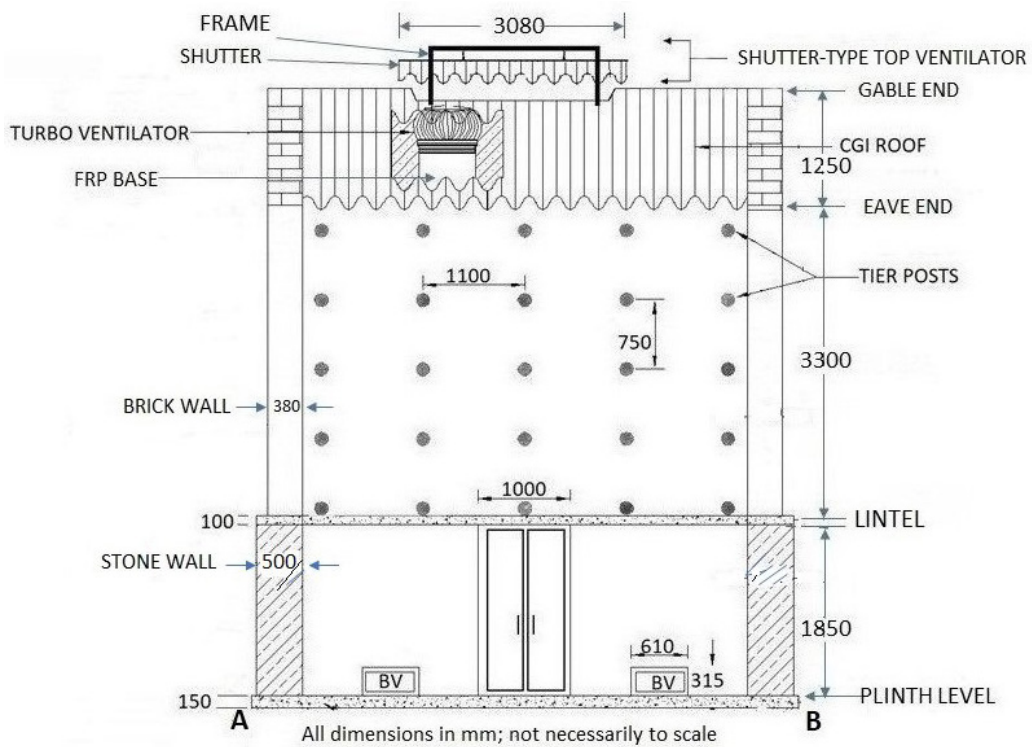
FRONT ELEVATION SIDE AB — BARN TYPE B
